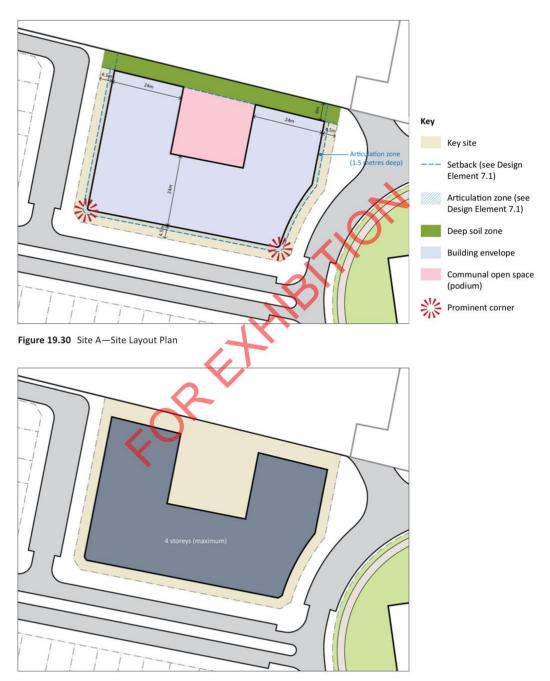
Site A—Building Height Plan (maximum number of storeys)
